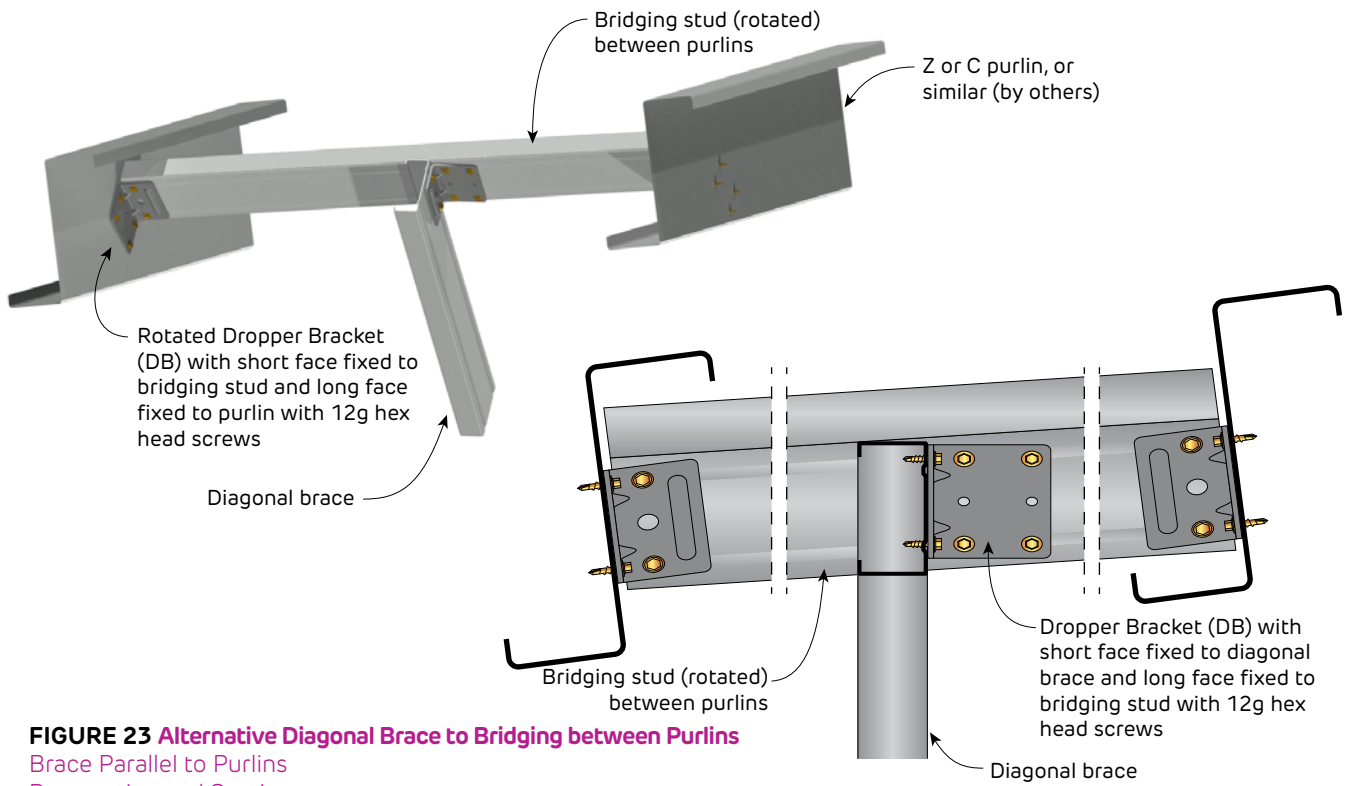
Alternative Diagonal Brace to Bridging between Purlins
